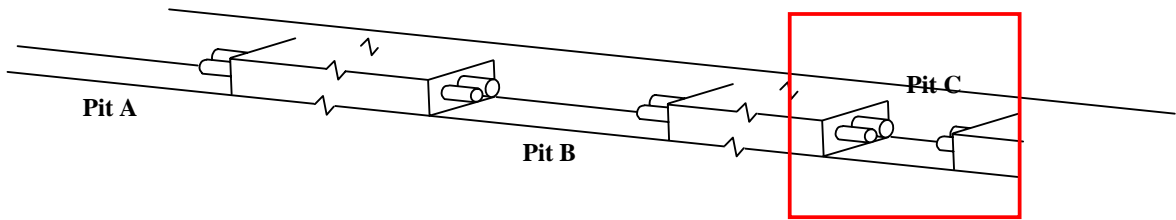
GRUNDORAM was being set up at Pit B for the ramming of 8" Steel Pipe to Pit C.
